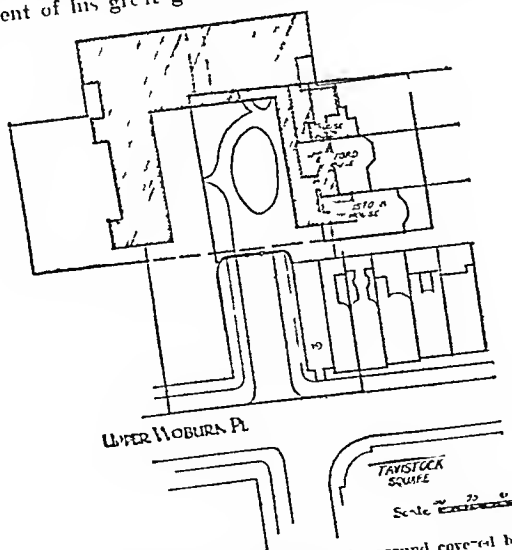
The hatched area shows the ground covered by the new building superimposed on the plan (in outline) of the old Bedford and Tavistock Houses.
